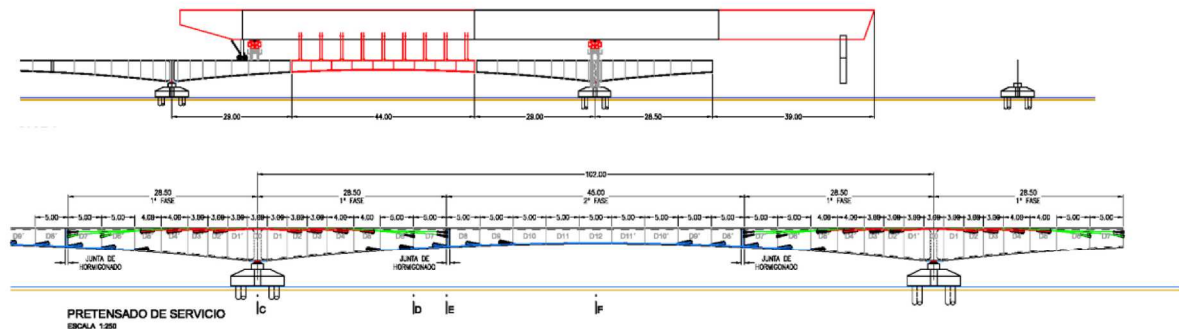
Second stage. Erection and prestressing of mid-span segments.
